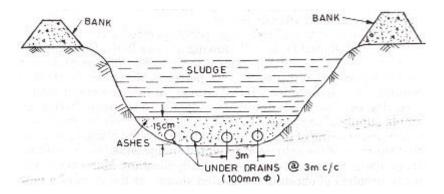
Typical section of a lagoon for disposal of raw sludge
